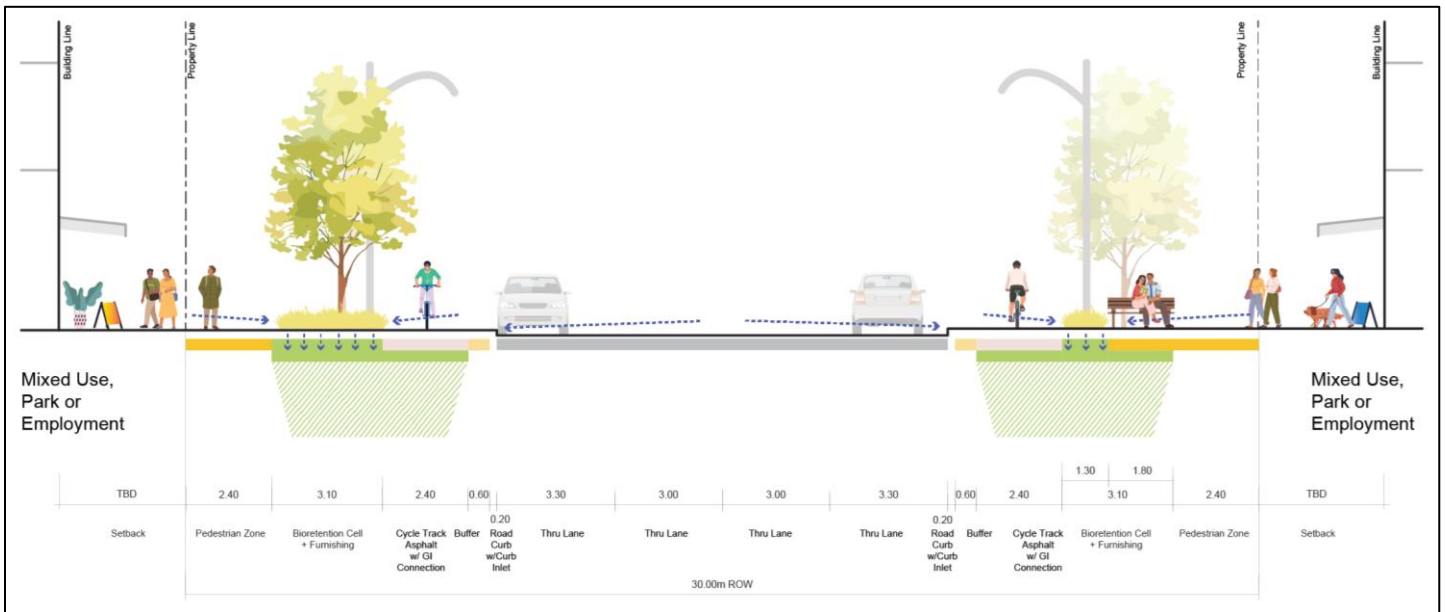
Northern Street (Sheppard Avenue West to Billy Bishop Way) Cross-Section – Option 3
